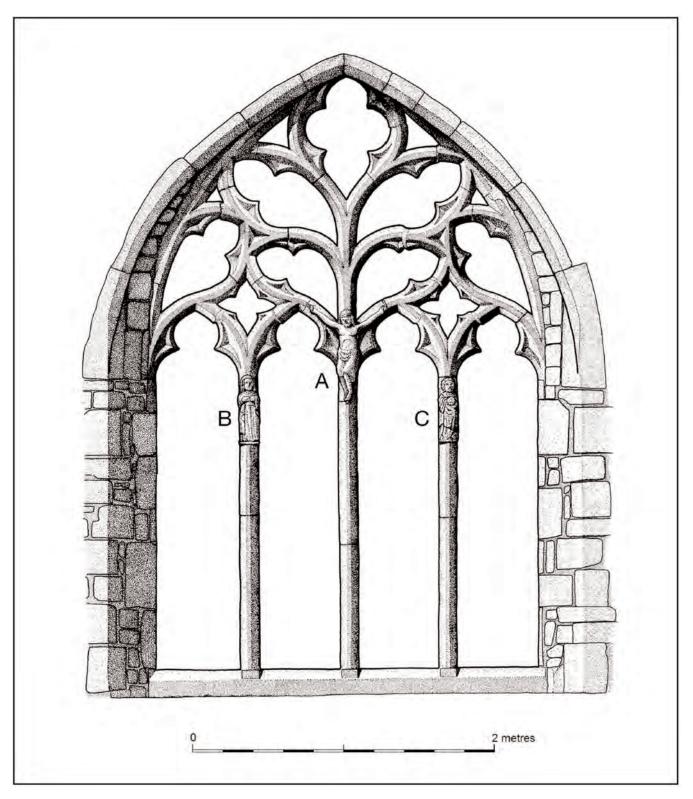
North aisle: east window. Internal elevation of the masonry. A, Christ (replacement figure); B, St Mary the Virgin; C, St John. Scale 1:25. Drawing: Simon Hayfield
